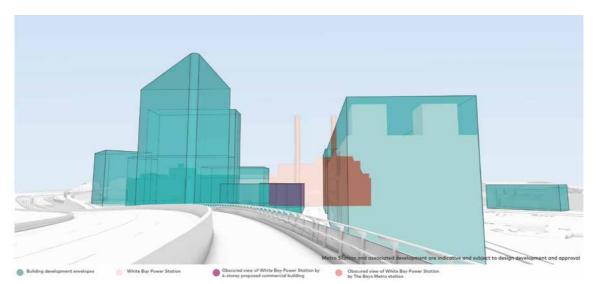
Page 130-131 Draft Bays West Stage 1 Master Plan
